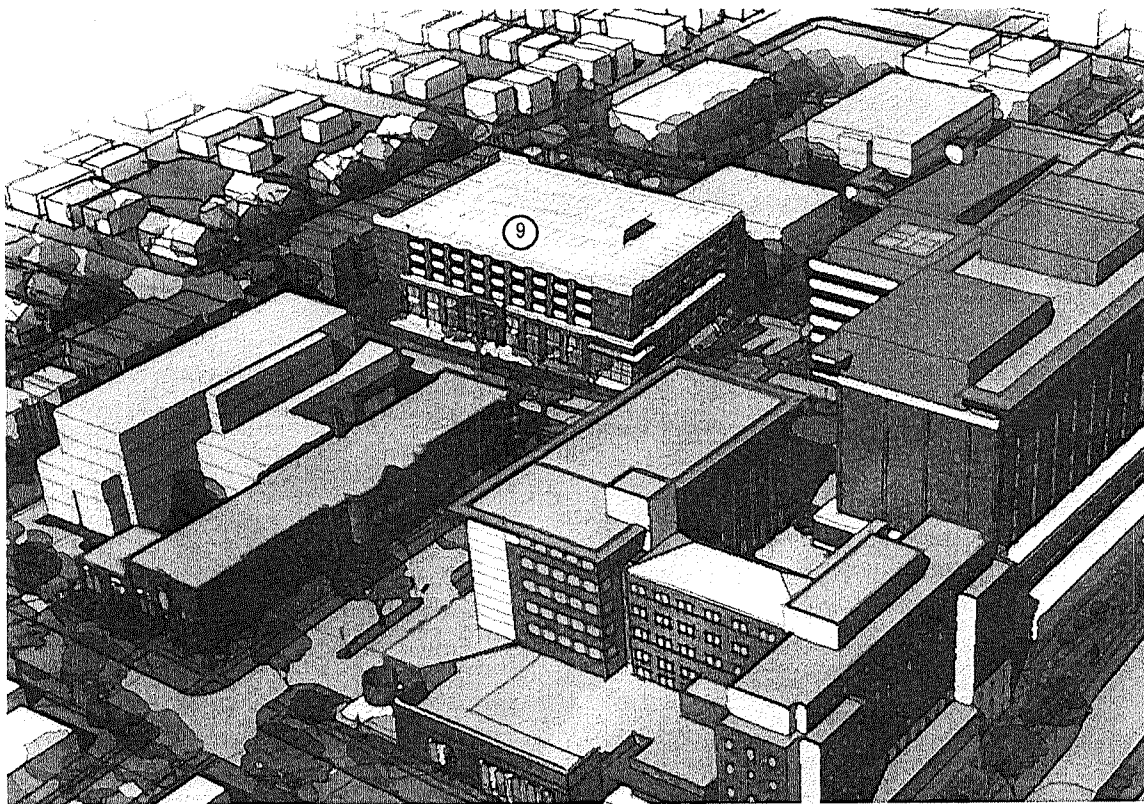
Aerial view of Brooks Street, showing possible massing of new McConnell Hall Building Development.
